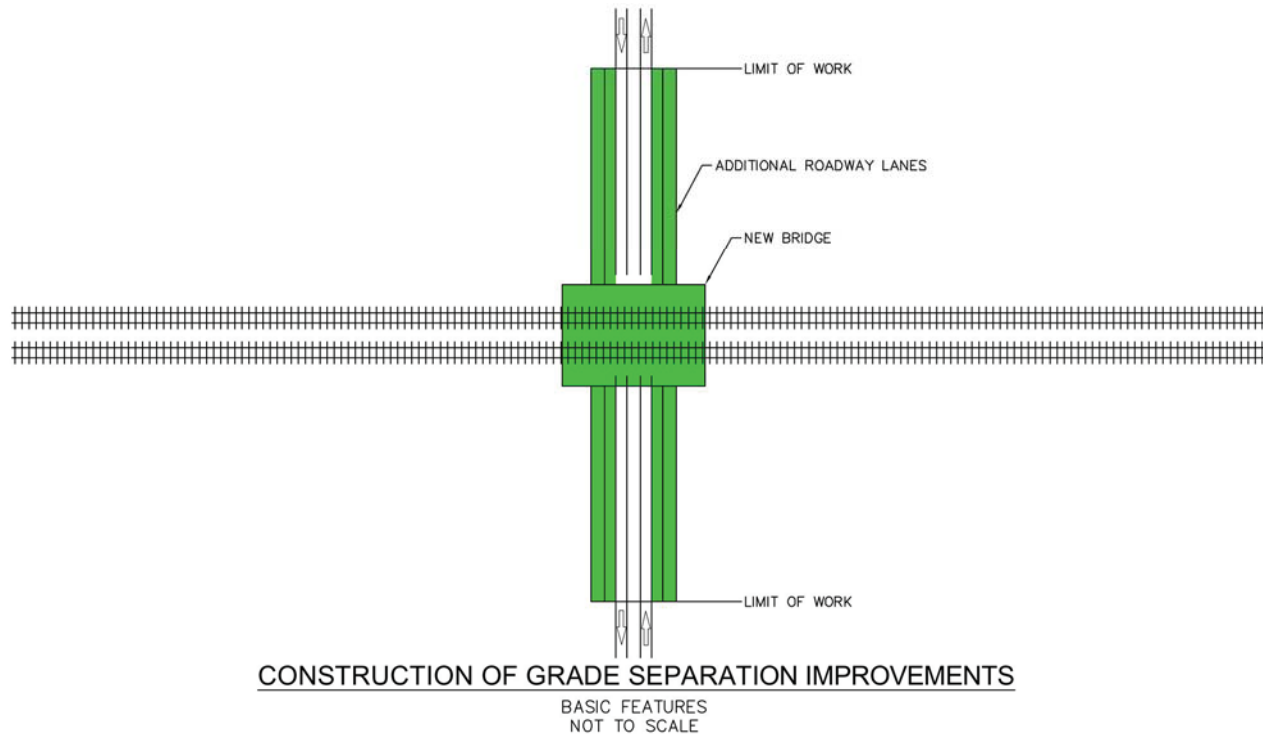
Typical Configuration – Construction of Grade Separation Improvements
